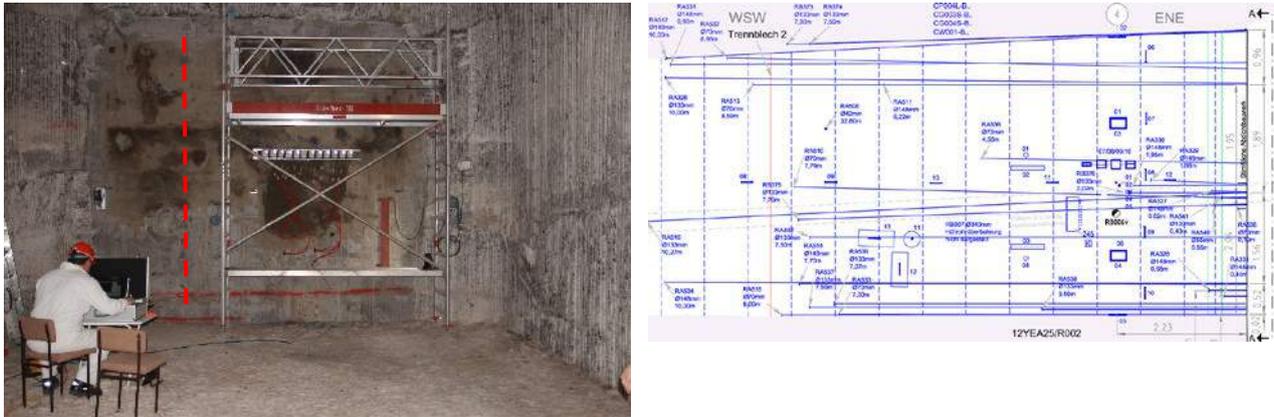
Left: LAUS applied to the center of the barrier at ERAM. Red dashed line: Profile discussed in Fig. 4 and Fig. 5. Right: Cross-section of the barrier. Front face is at the right. Vertical red line is the steel plate.
